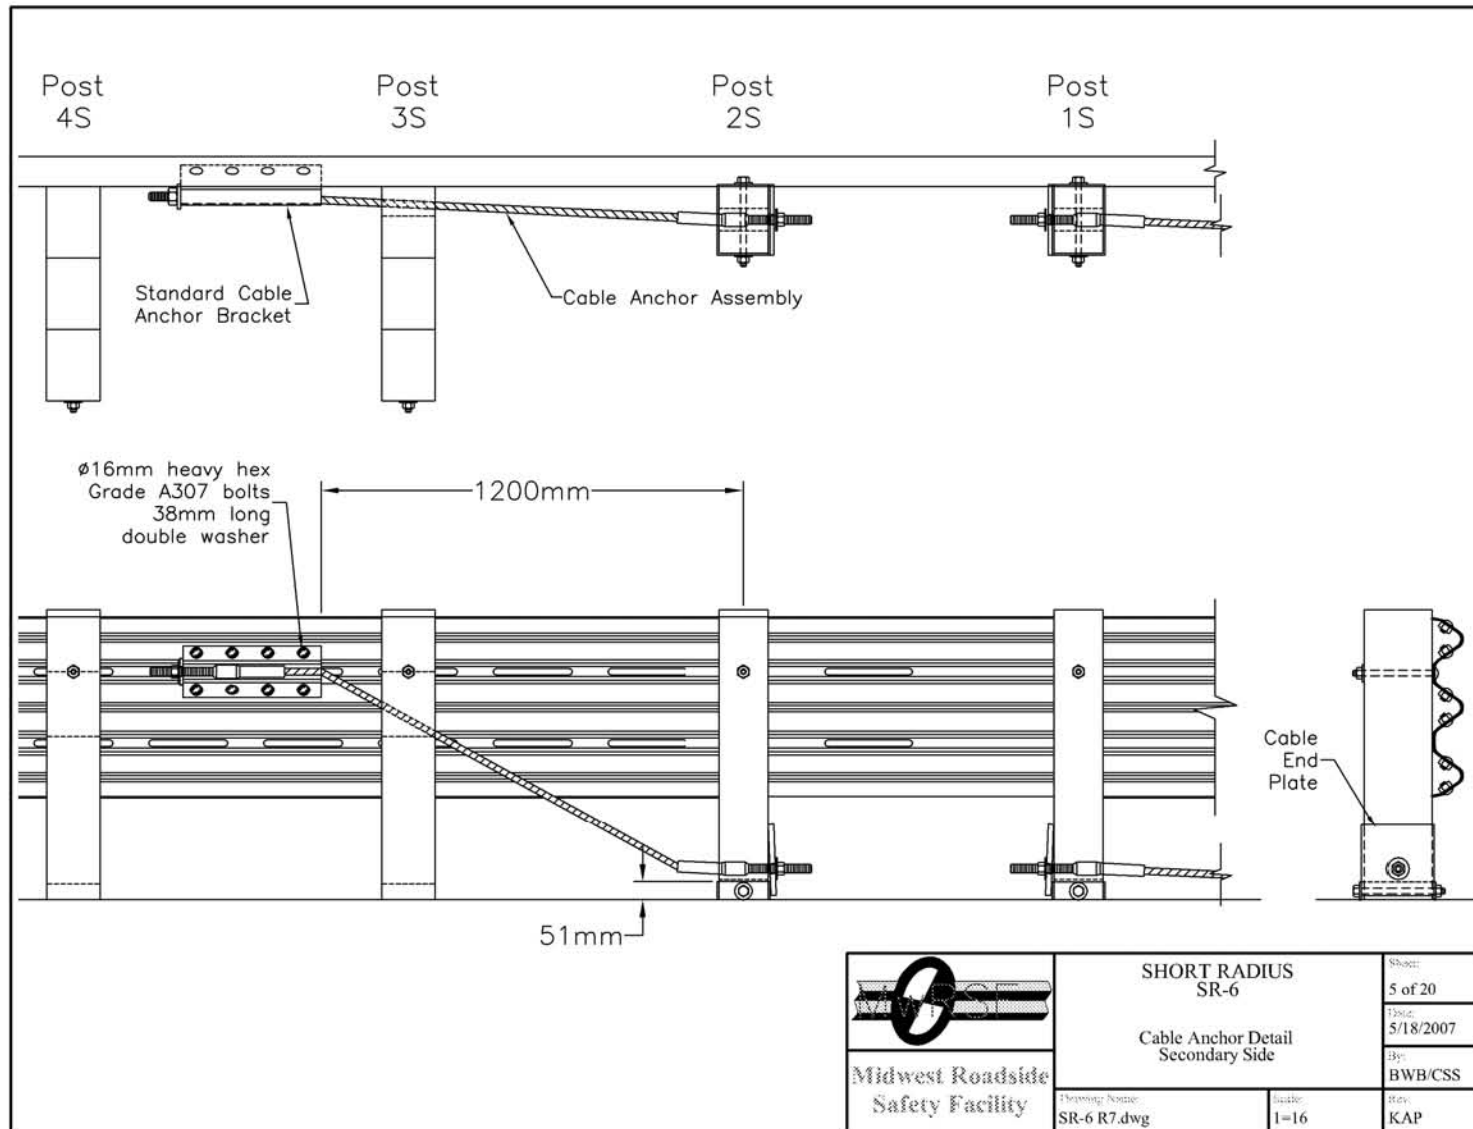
Secondary Side Cable Anchor Details, Test SR-6
